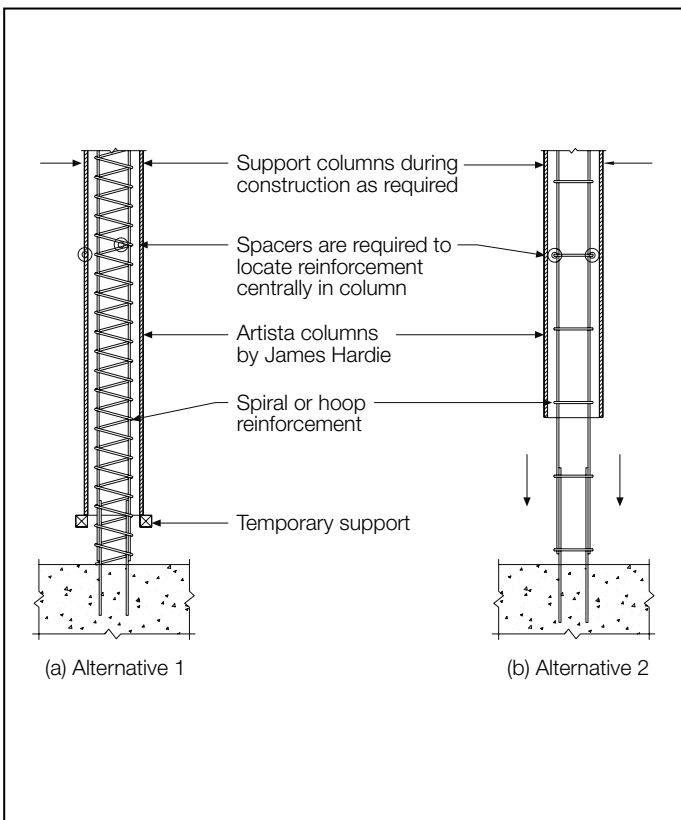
REINFORCED COLUMN INSTALLATION DETAIL
